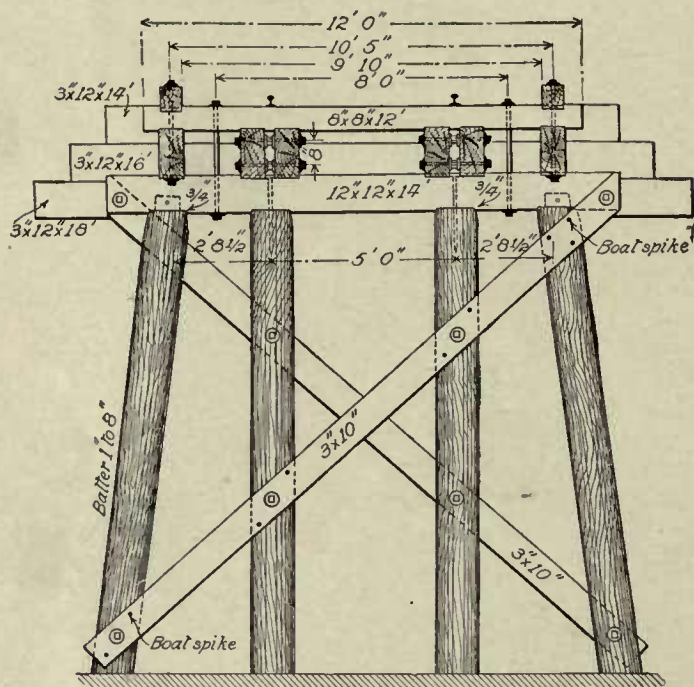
PLATE I.—STANDARD PILE-TRESTLE, DENVER & RIO GRANDE RAILROAD.
